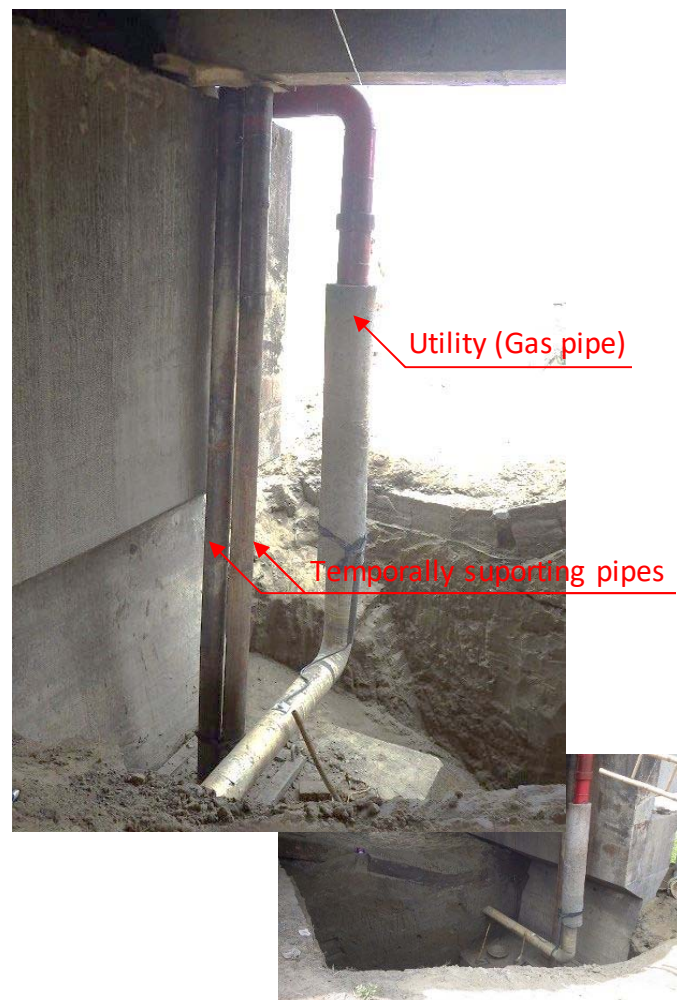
Temporary Support on the damaged Girder & excavation to build brick support (P1, Dhaka side)
